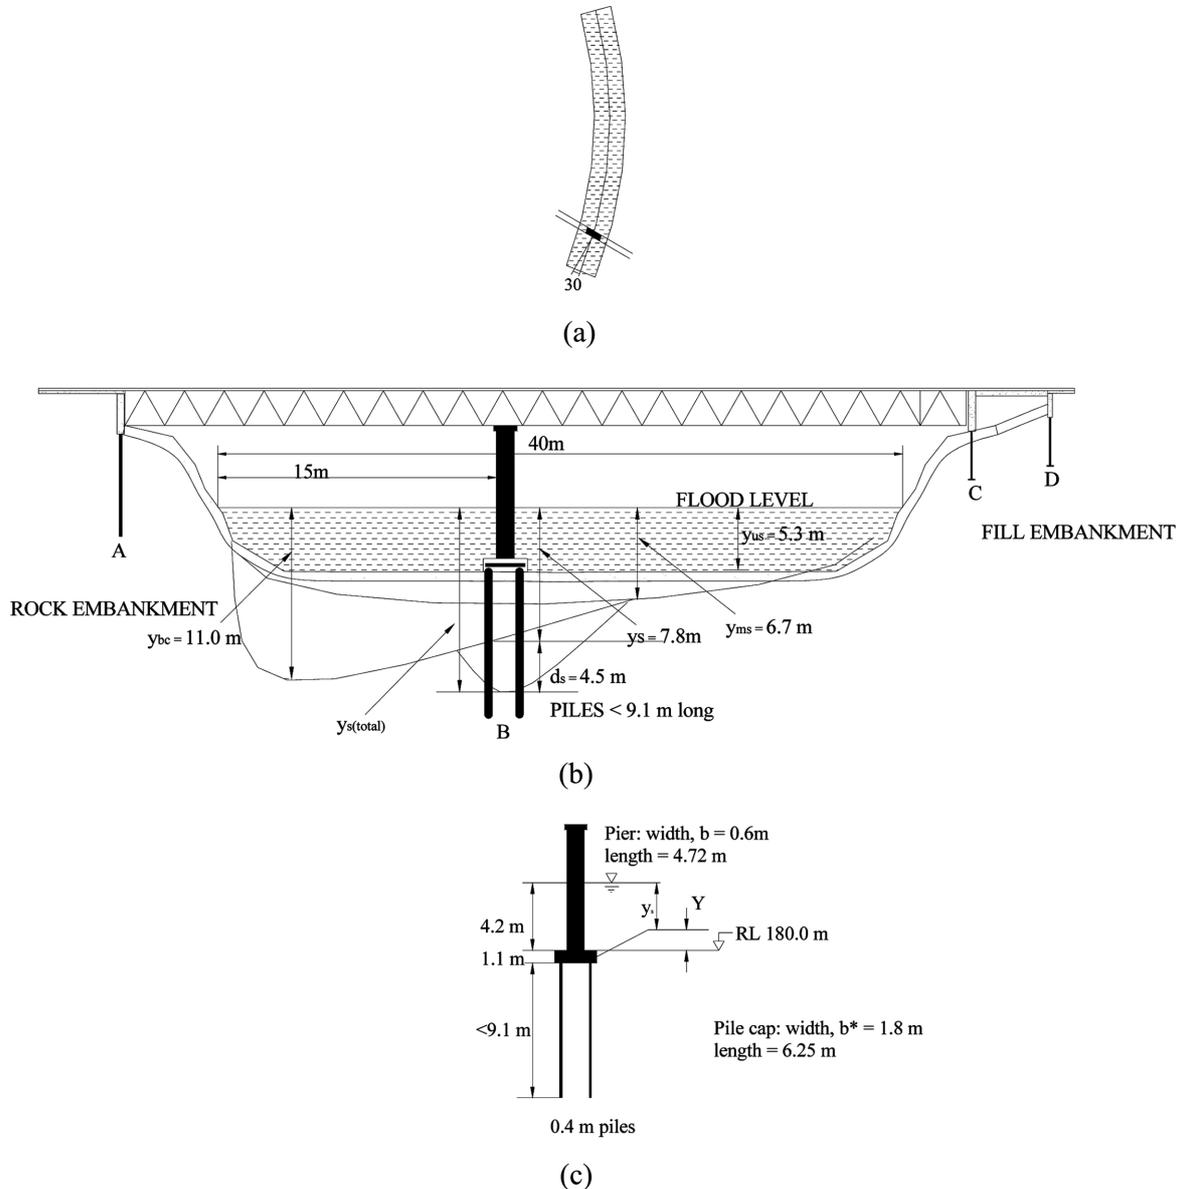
Details of Blackmount Road Bridge; (i) schematic plan view of bridge, (ii) Elevation of bridge looking downstream, and (iii) Pier elevation
